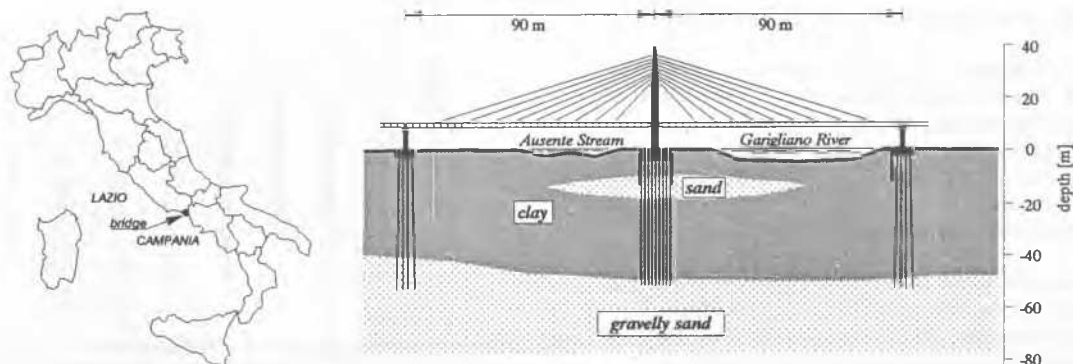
Location of the bridge and sketch of the two central stayed spans
